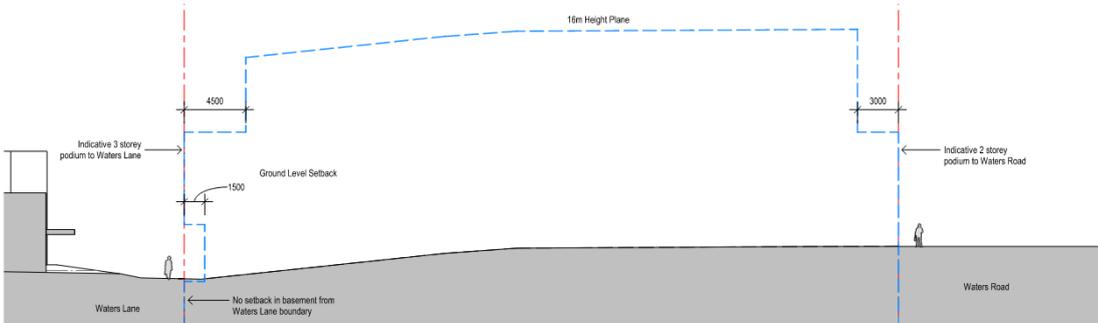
Permitted Building Envelope illustrated in section (source: SJB Architects)
